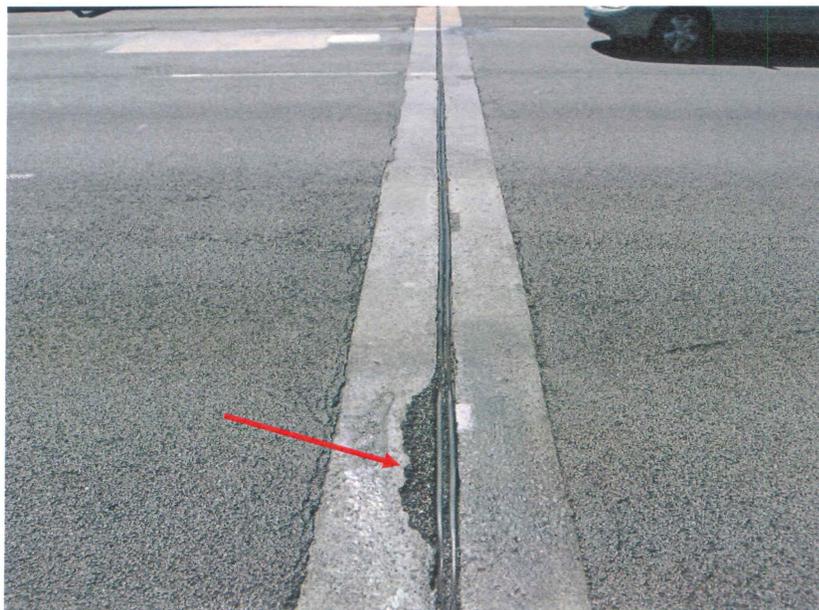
Deck joint at Pier 4. Note the spall in the concrete header.
